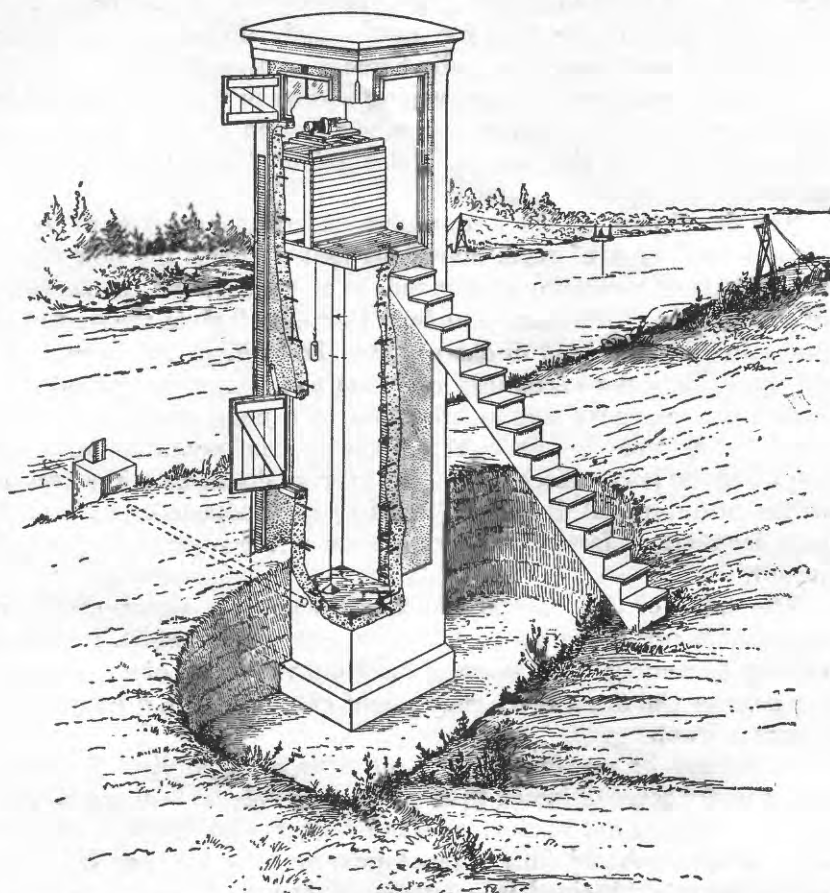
Typical river-measurement station, showing concrete well and house for water-stage recorder and staff gages, cable, and car.
